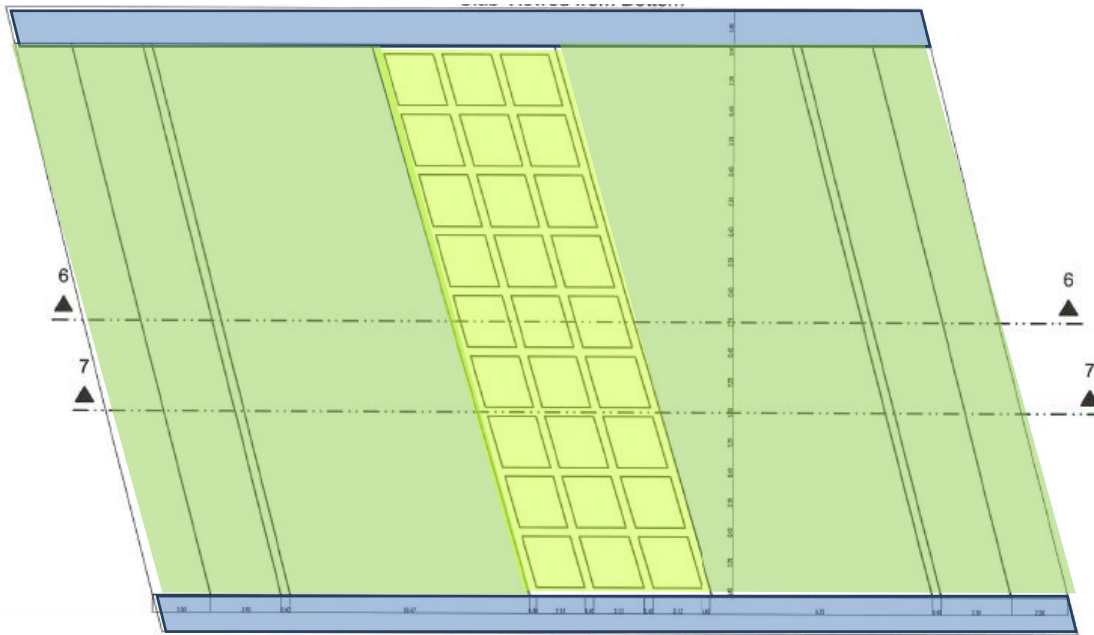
Disposition of arch cantilever slabs (green), simple beam slab (yellow) and cantilever side slab (blue) in plane of the bridge (bottom side)
